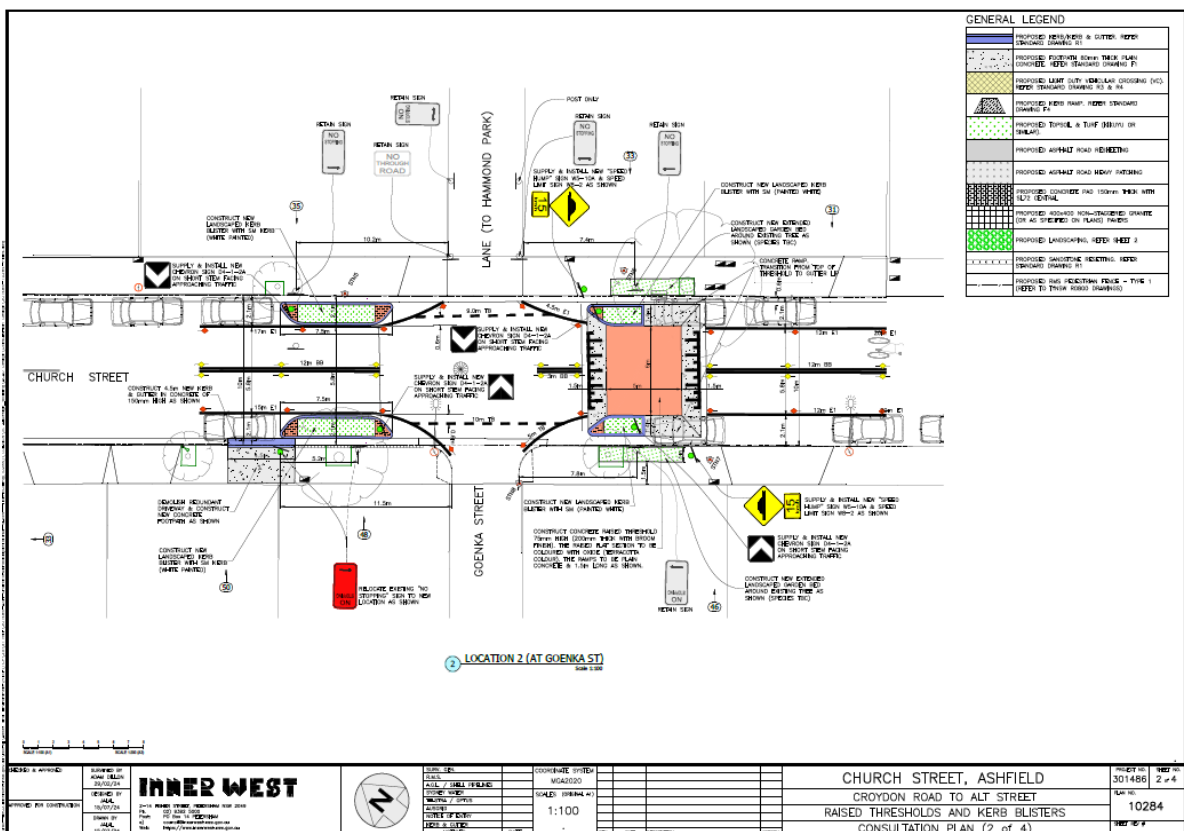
Initial consultation plan 10284 (plan 2 of 4)
